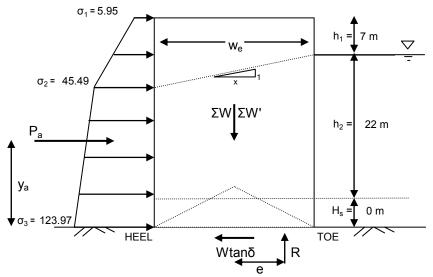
Sliding, Overturning, and Slipping Stability Check
